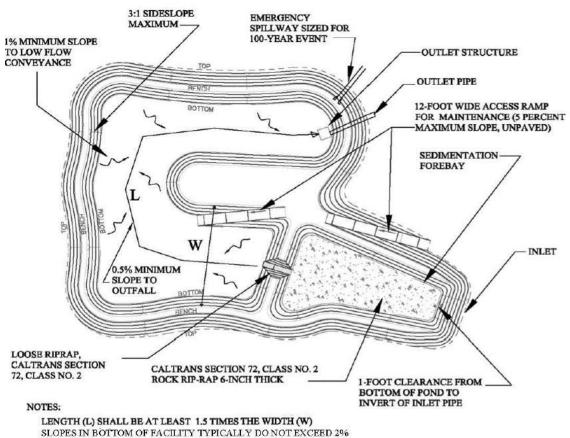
Plan View, Typical Extended Detention Basin
